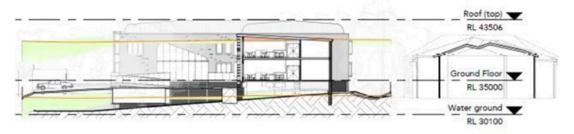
Section C with 8 metre projected existing ground plane (Source: Team 2 Architects)
